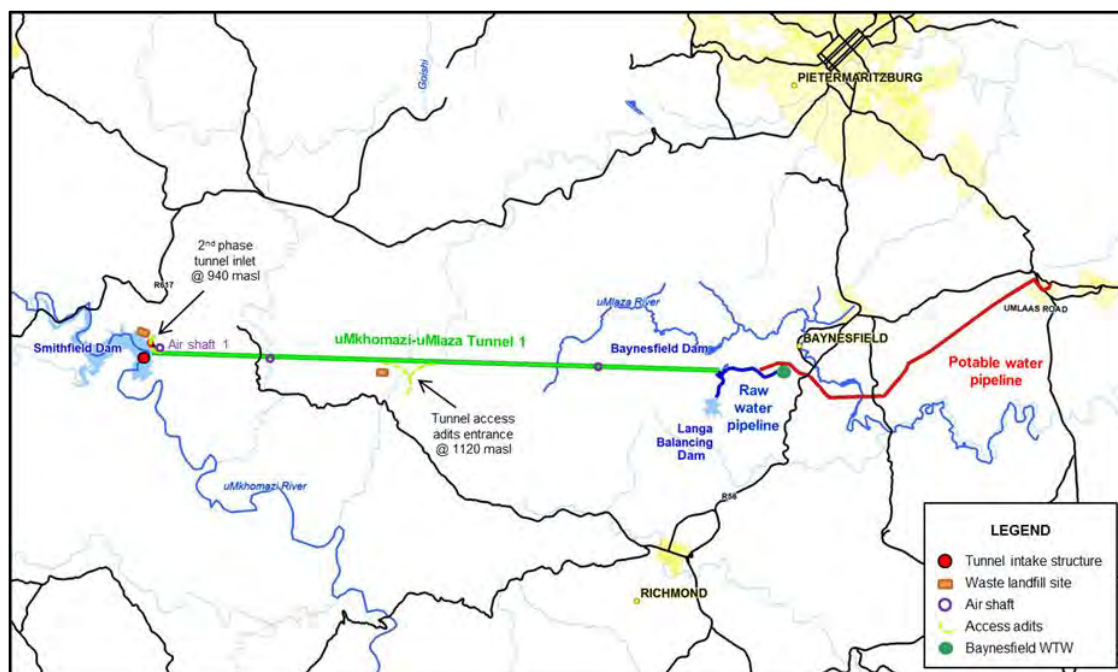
Layout of the Proposed Bulk Water Conveyance System
